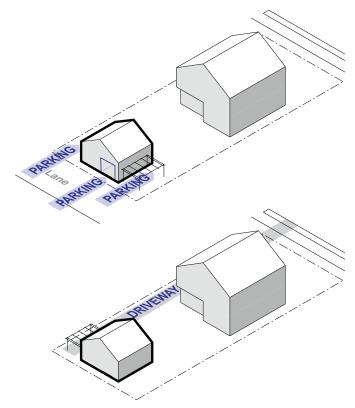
Parking should be provide in a surface space or in an enclosed garage in the coach house provided at least 30% of the gross floor area is located on the ground floor.
